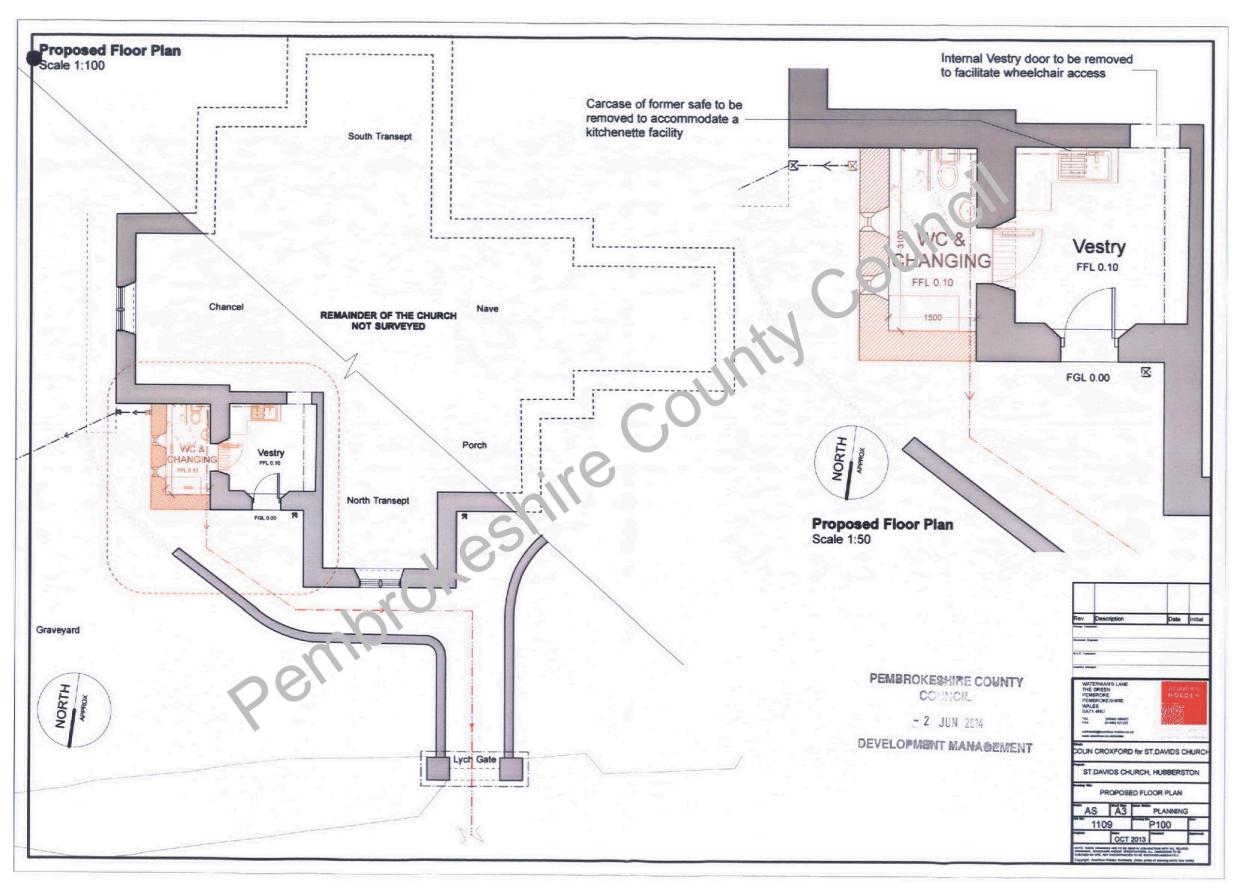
Proposed floor plan showing extension for toilet facilities to the east of the vestry and the associated drainage to the north of the church building and exiting the graveyard at the Lych Gate (taken from Pembrokeshire County Council Planning website).
